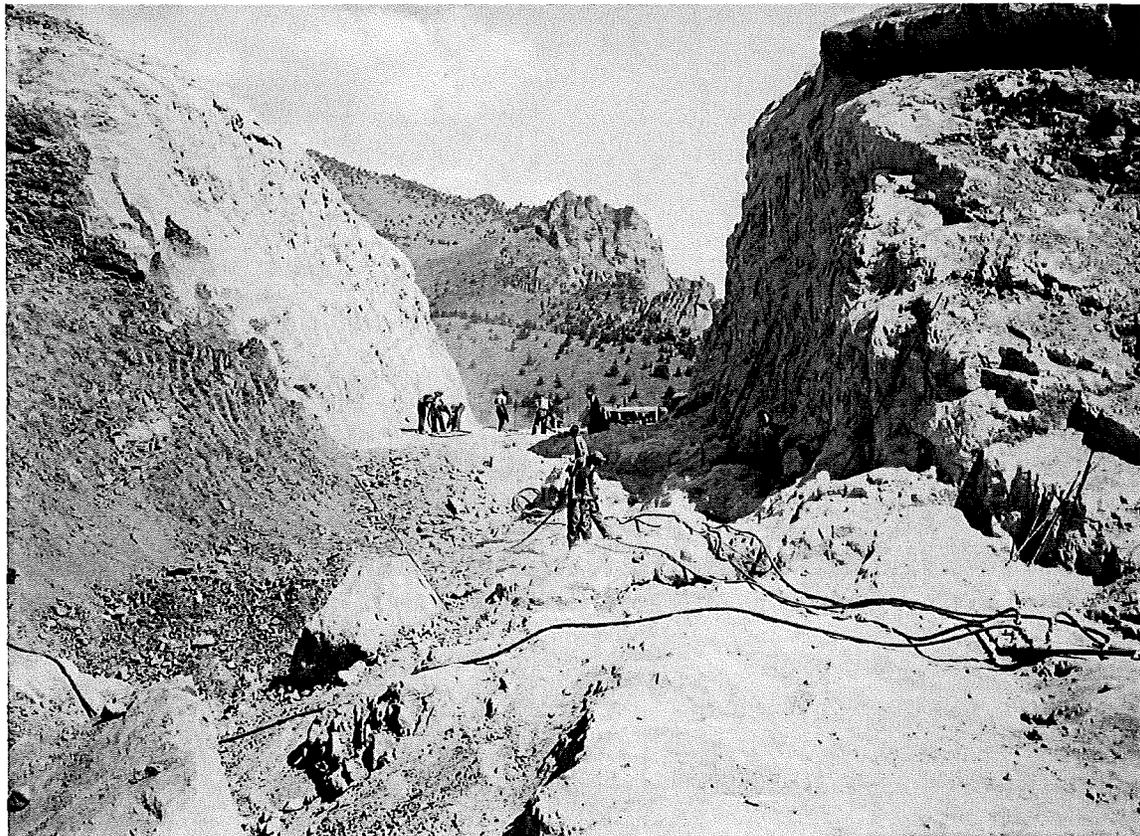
CCC enrollees drilling rock cut at Station No. 1552 in the North Unit Main Canal, 1941.
